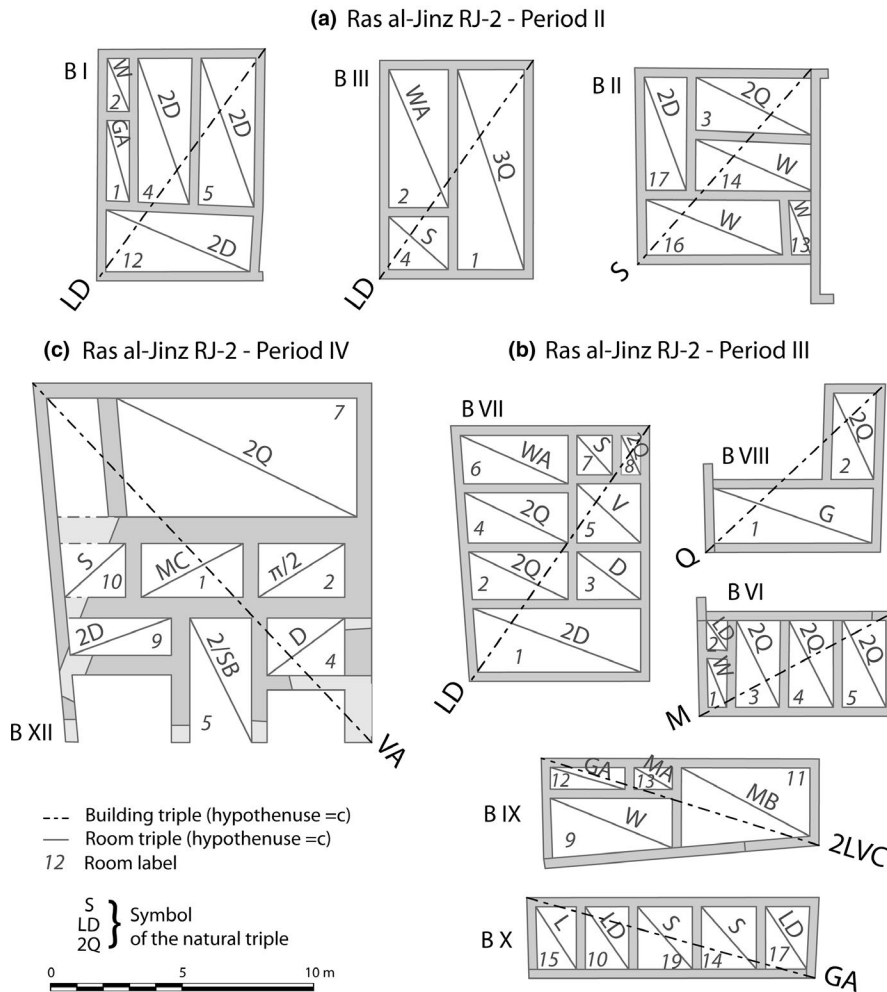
Application of natural triples to the structures of RJ-2, the example of building plans and rooms (plans: V. Azzarà)
